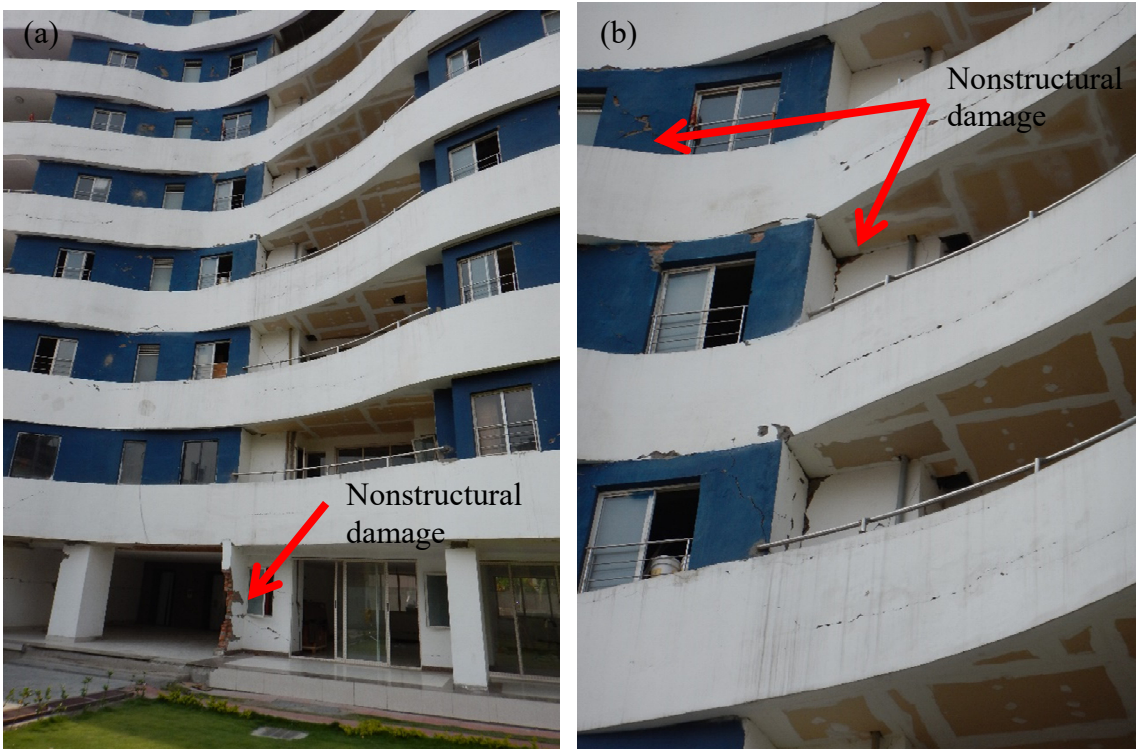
Silver City Apartment Complex – exterior non-structural masonry wall damage: (a) base; (b) upper stories around windows and reentrant corners.
